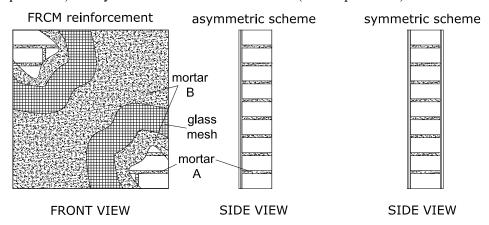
Reinforced masonry wallettes with FRCM technique: asymmetric reinforcement scheme (RF-A specimens) and symmetric reinforcement scheme (RF-S specimens). Sizes in mm.
